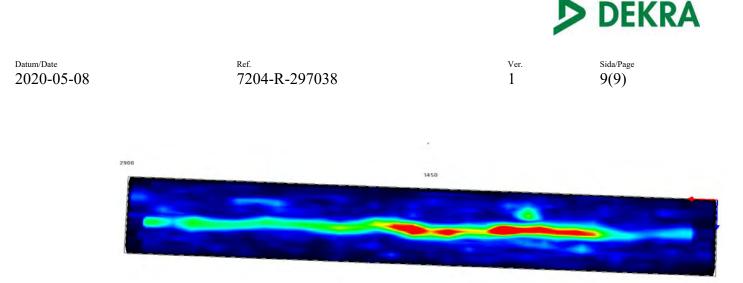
Cable duct 6B, from anchor to the right and 3 meters towards west support.
